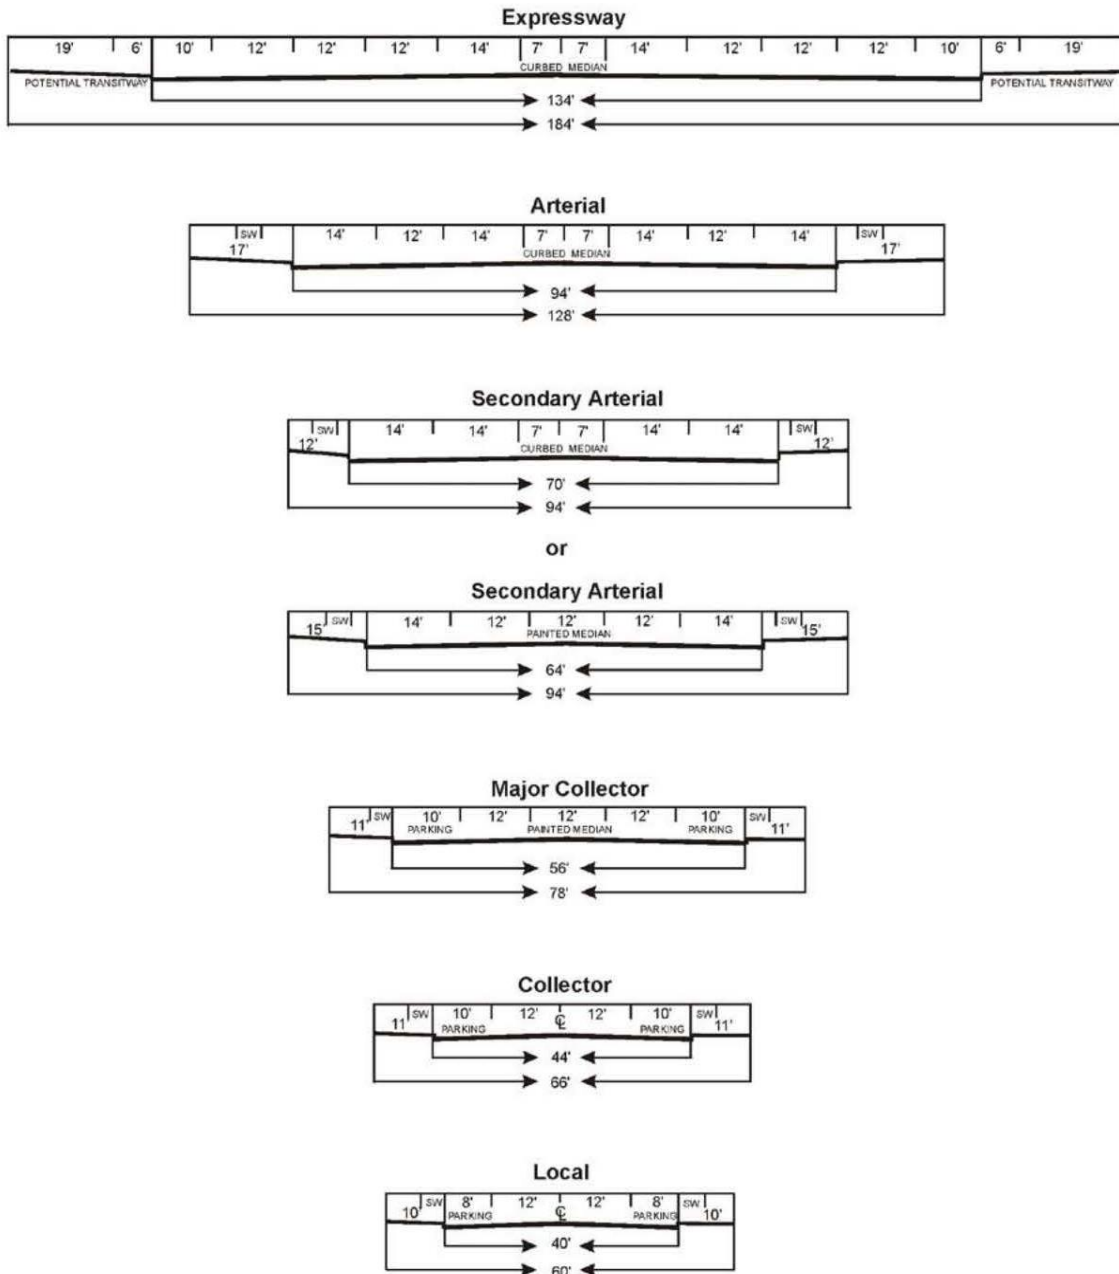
CITY OF PERRIS GENERAL PLAN ROADWAY CROSS-SECTIONS
